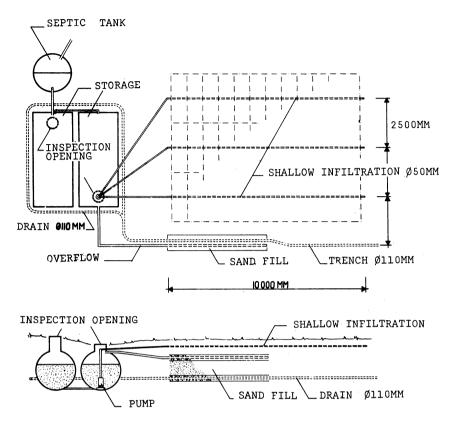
Performing of experiment with storage and infiltration in shallow trenches.
